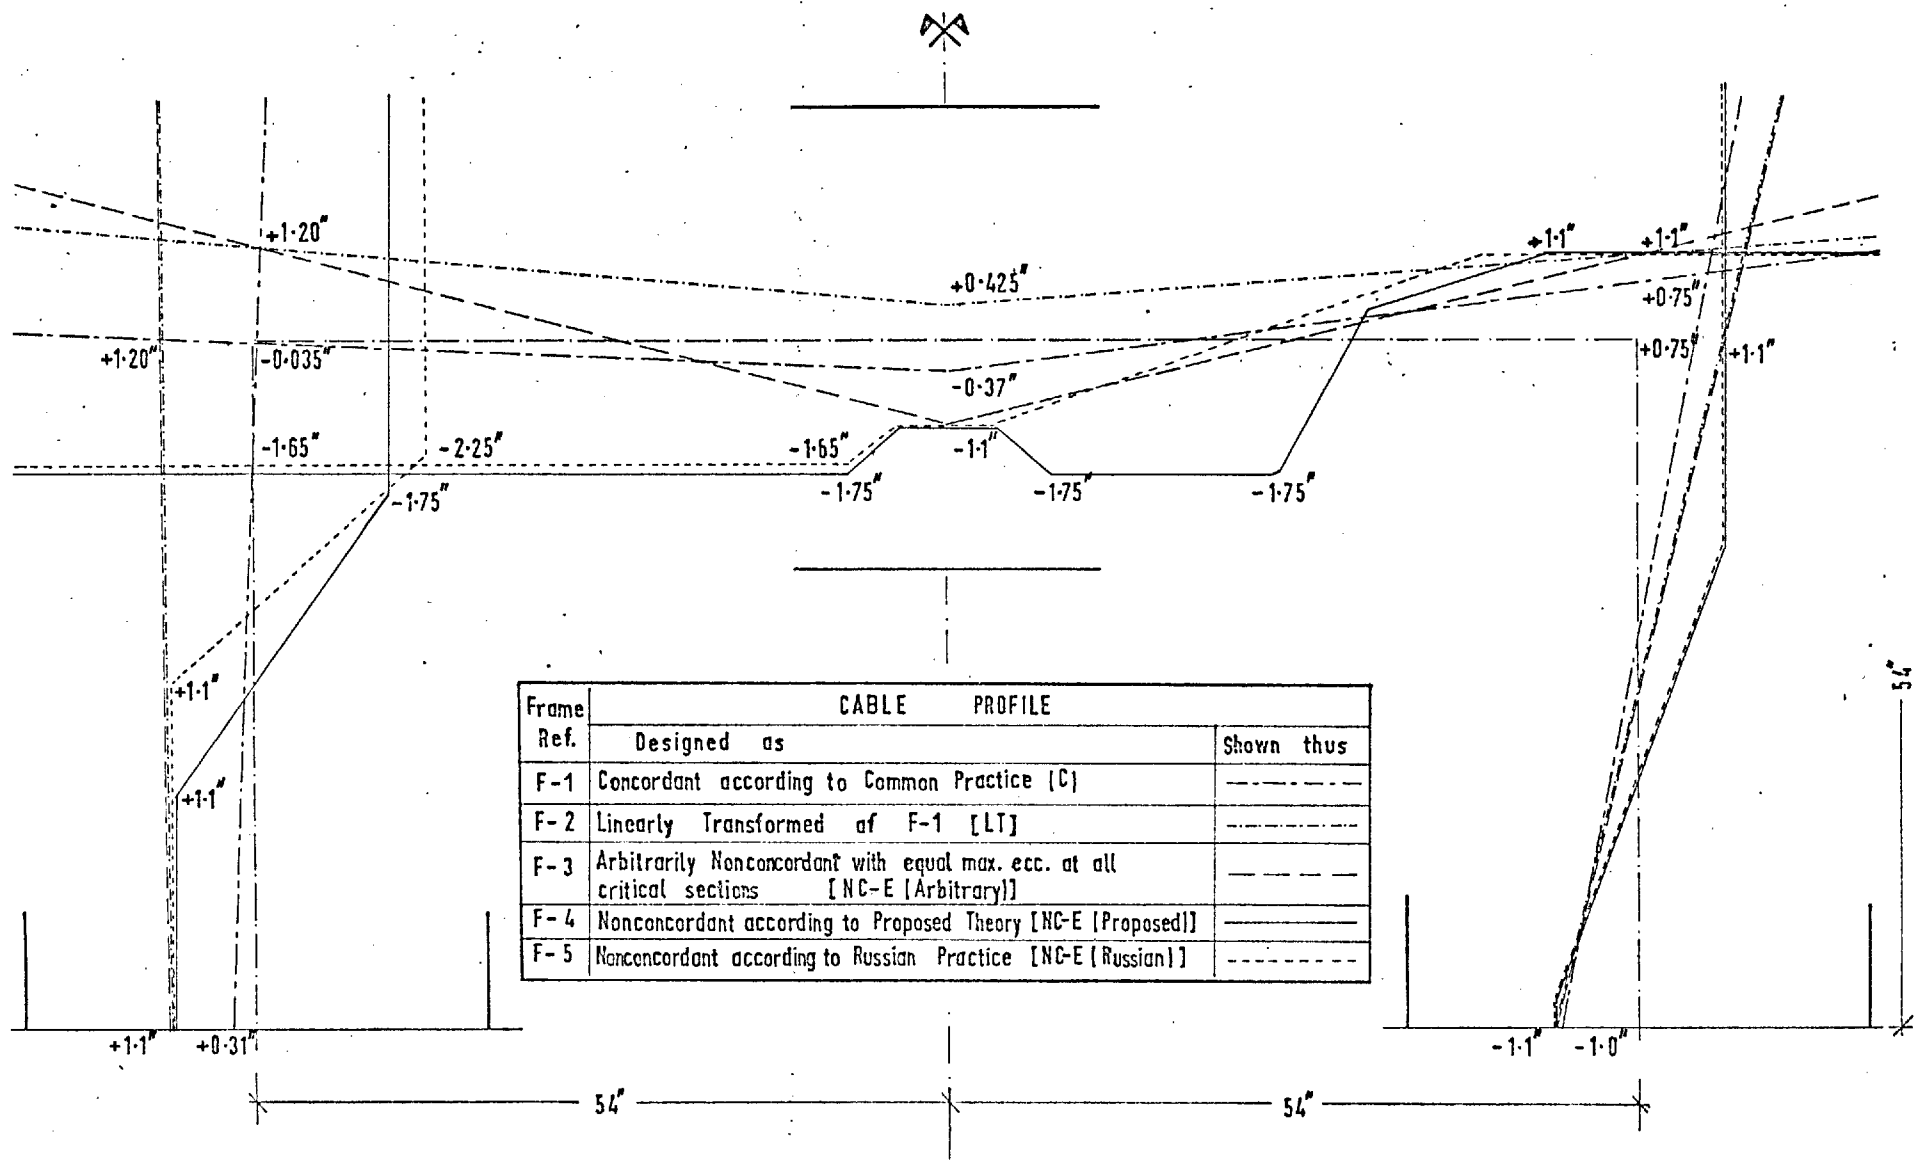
TEST FRAMES — CABLES PROFILES
